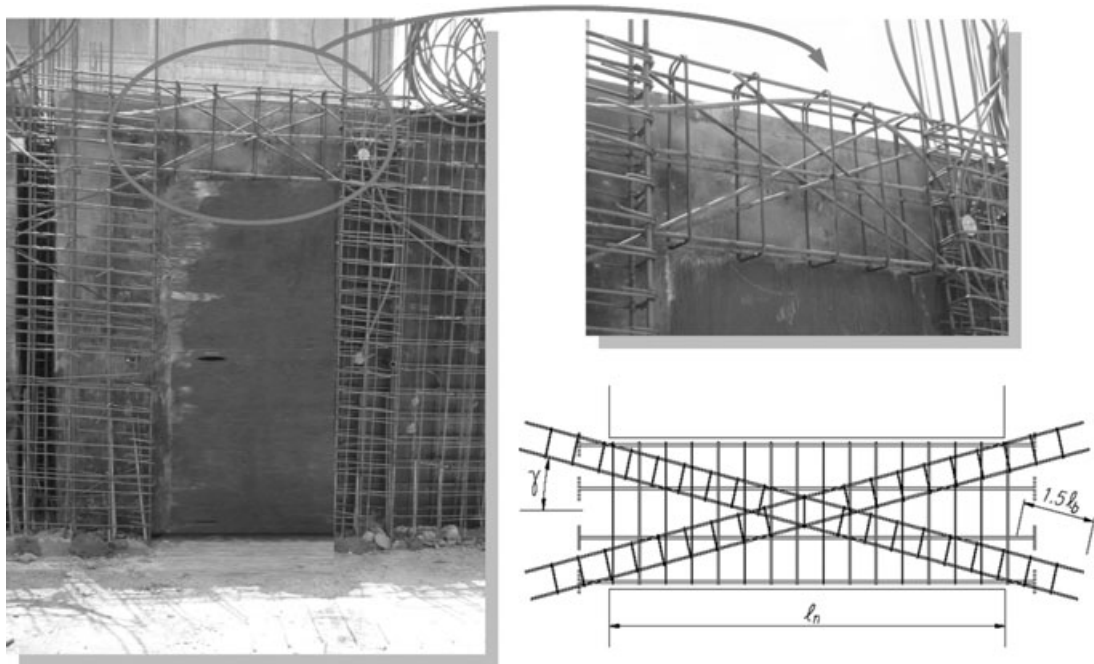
Comparison of reinforcement detailing for coupling beams used in practice with code-recommended detailing
